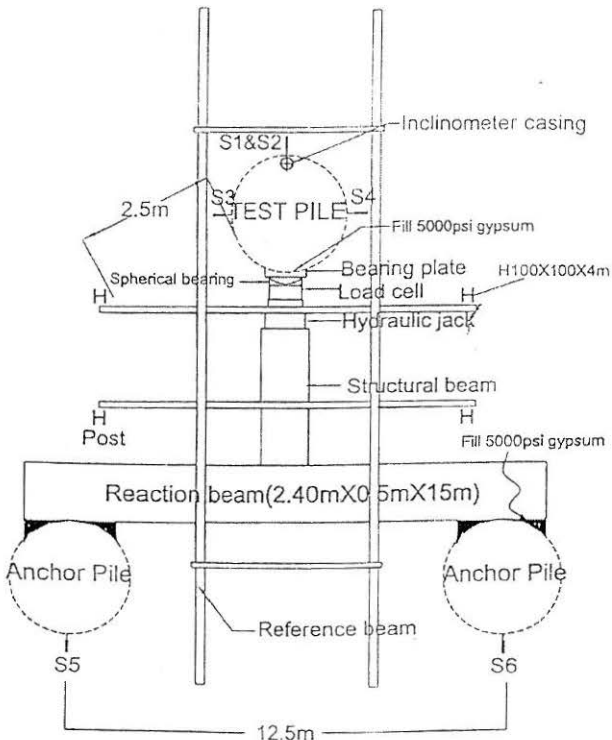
Typical Load Testing Arrangement for Lateral Testing of Pile
